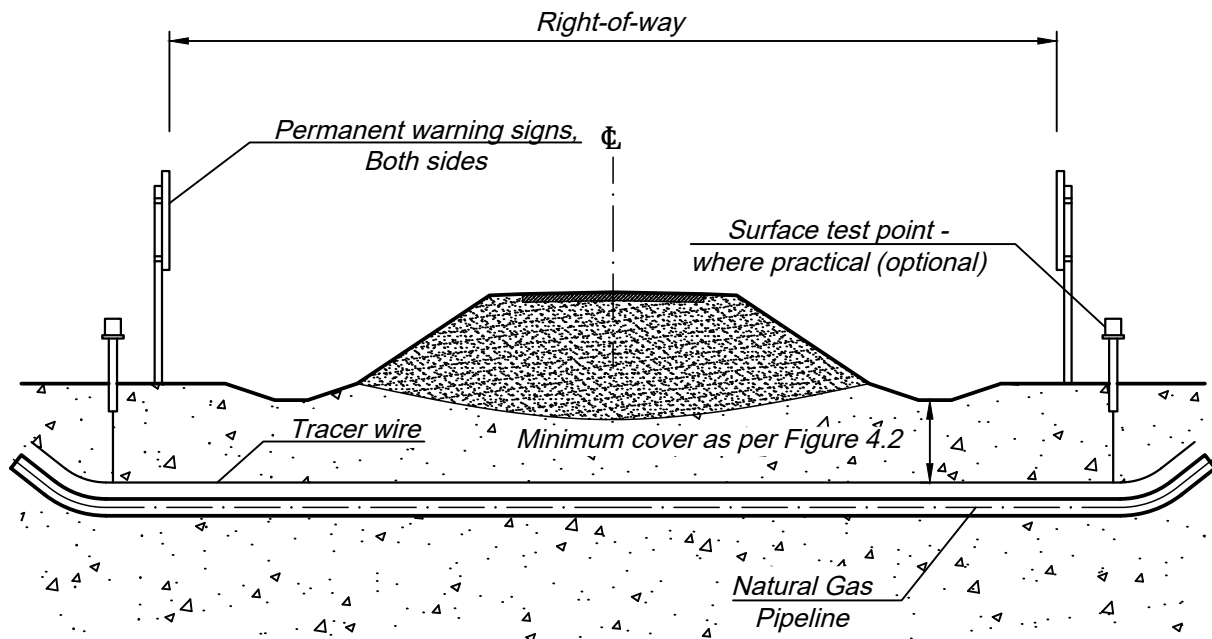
TYPICAL HIGHWAY OR ROAD CROSSING
